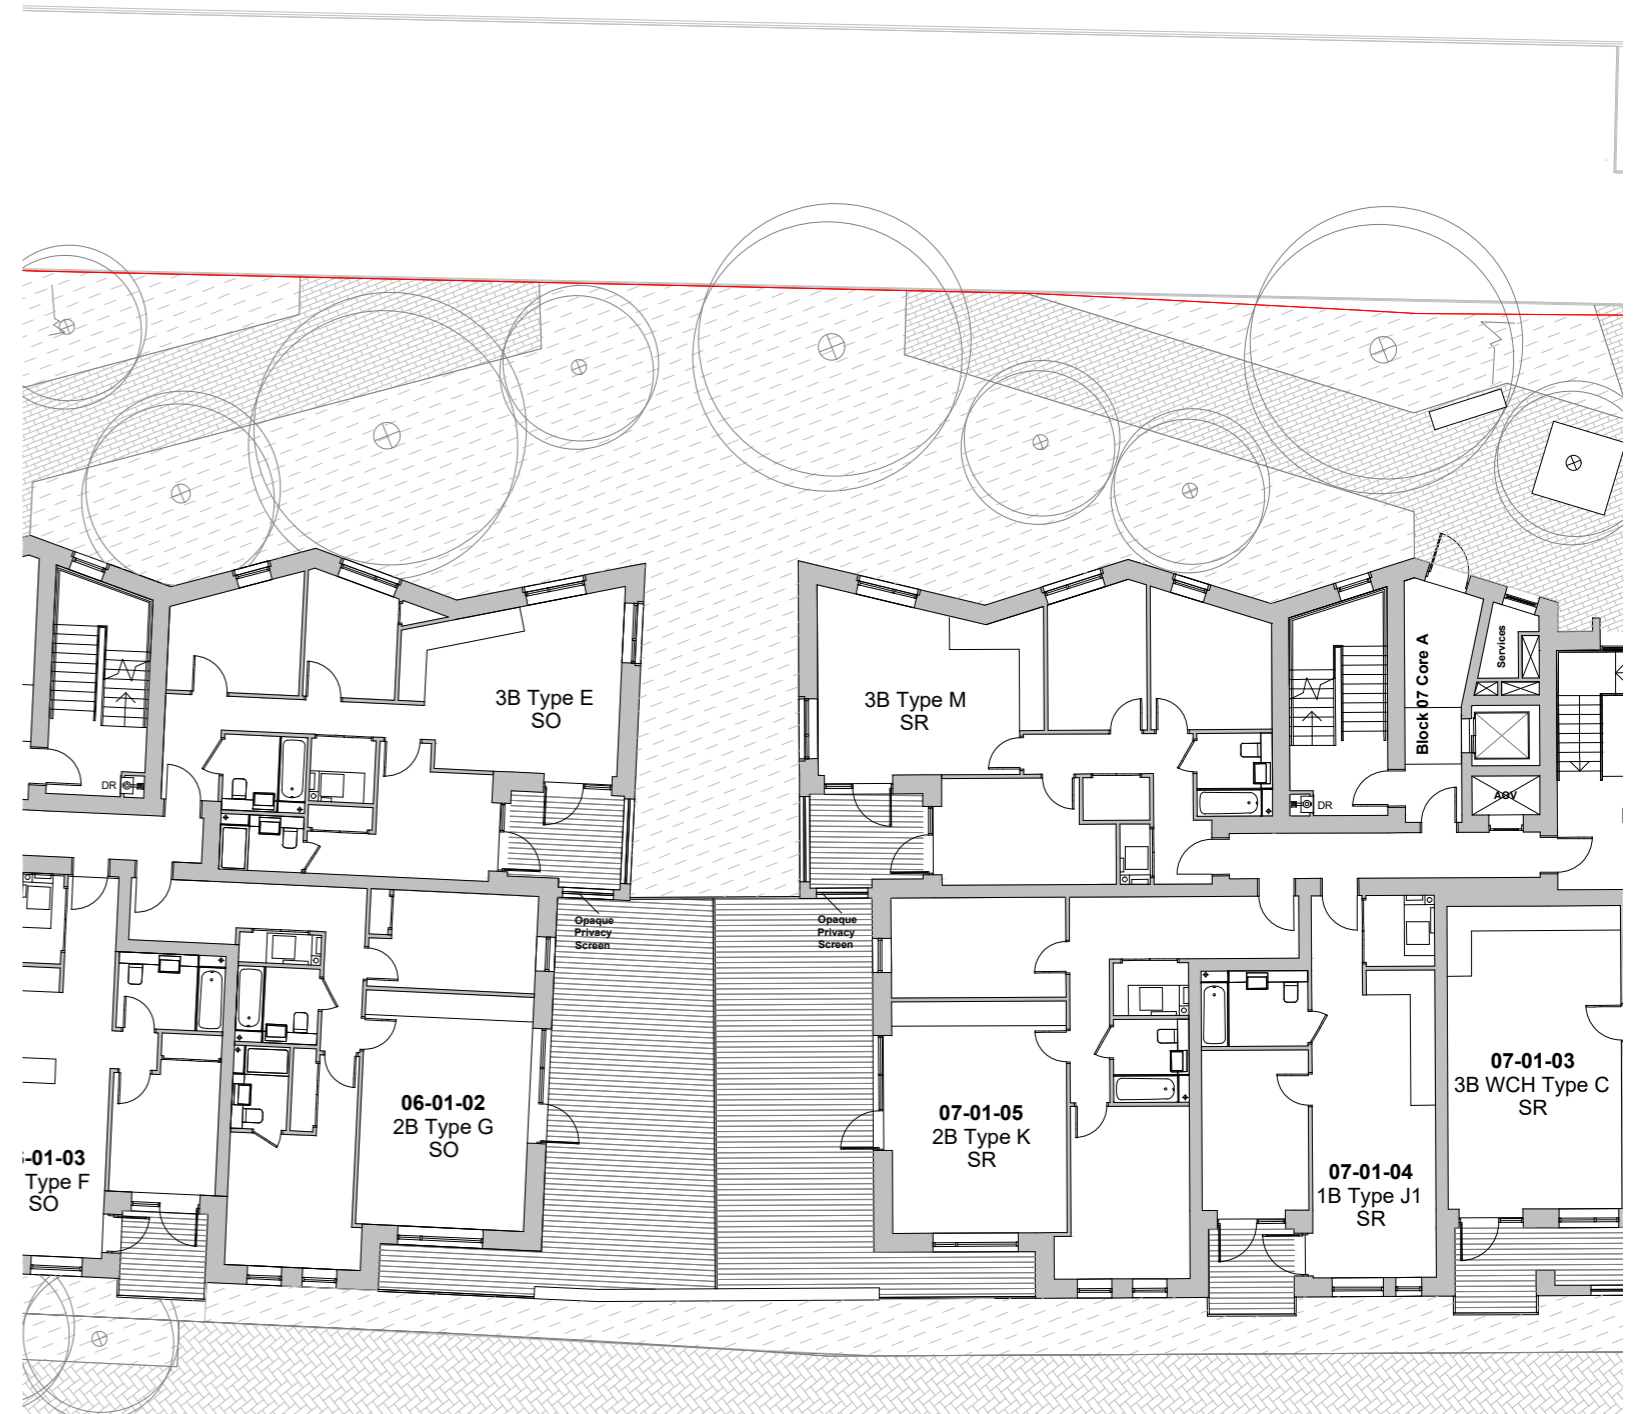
Extract of revised Ground Floor Plan, showing the location of the 2 additional flats.
